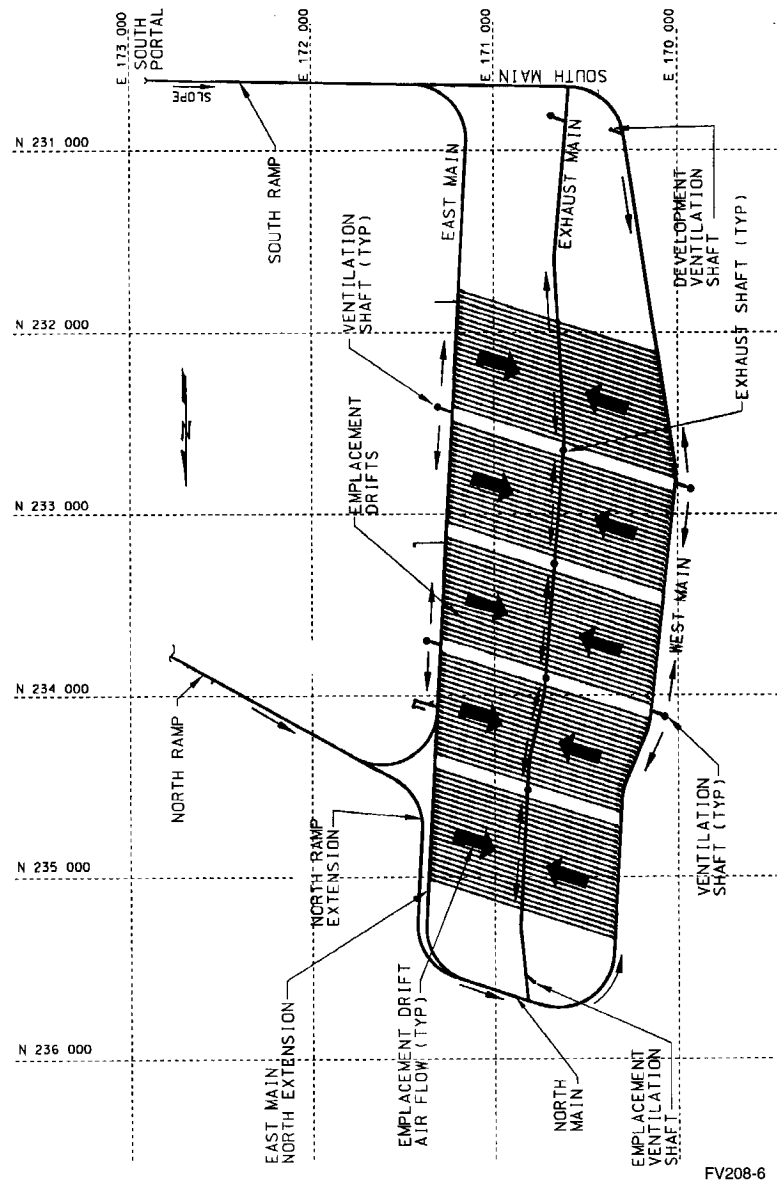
Continuous Ventilation Subsurface Repository Layout
